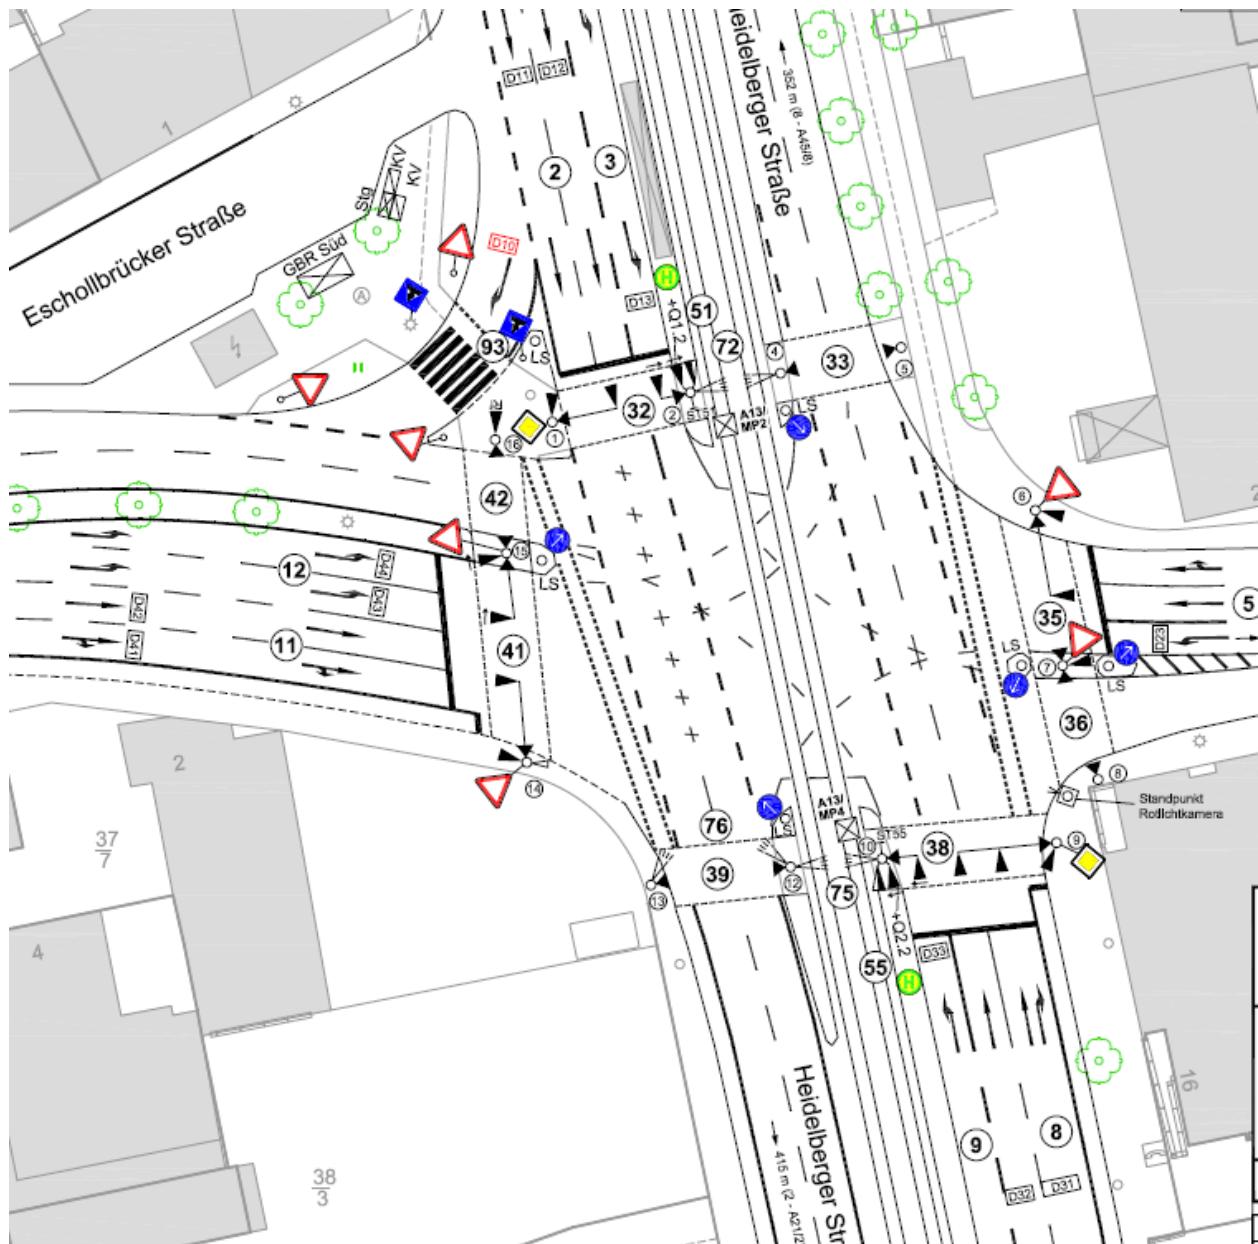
Junction Layout of A13 Intersection, Darmstadt (Source: Darmstadt Town hall)
